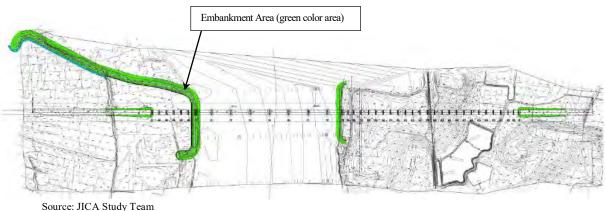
Embankment in the Project Area (Approach Road, Guidebank and Revetment)
